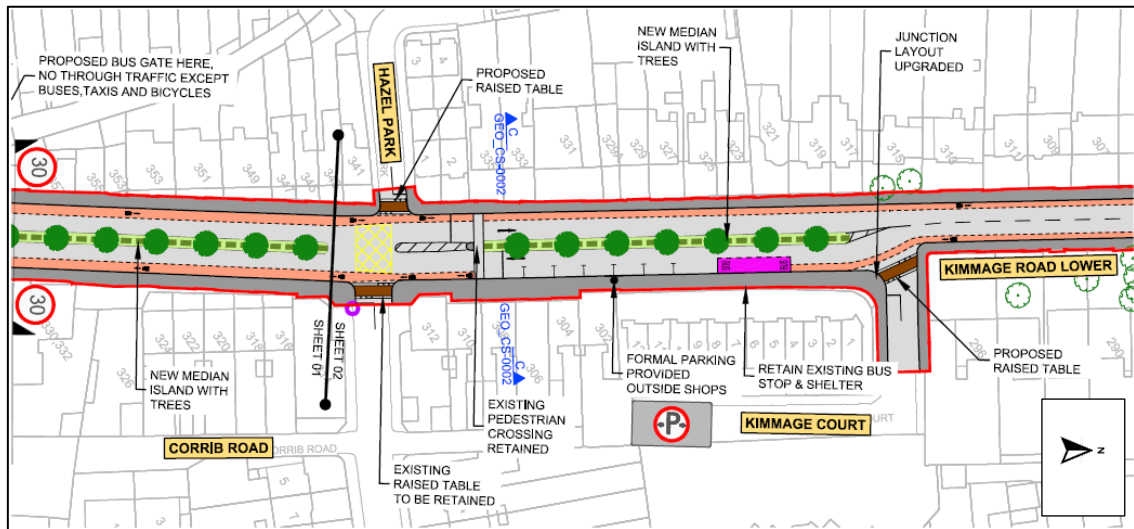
Proposed Public Realm Improvement on Kimmage Road Lower at the Corrib Road Junction
